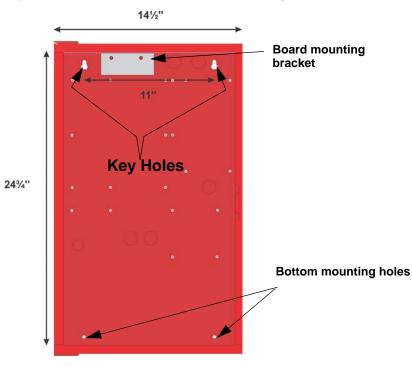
Cabinet Flush Mount Dimensions and Mounting Hole Locations
